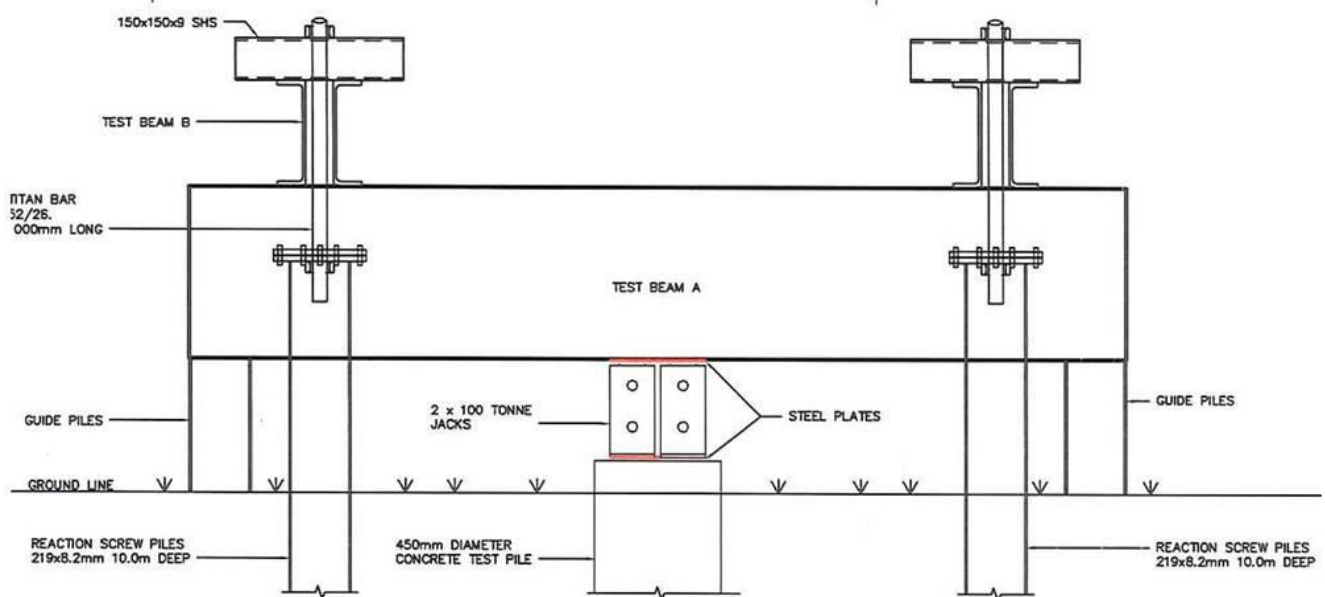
Typical arrangement of a static pile load test with reaction piles
